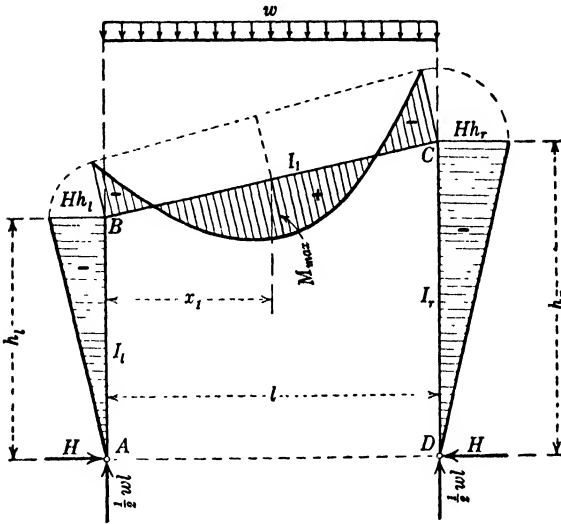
Slanting Roof. Uniformly Distributed Load. (See p. 311.)
